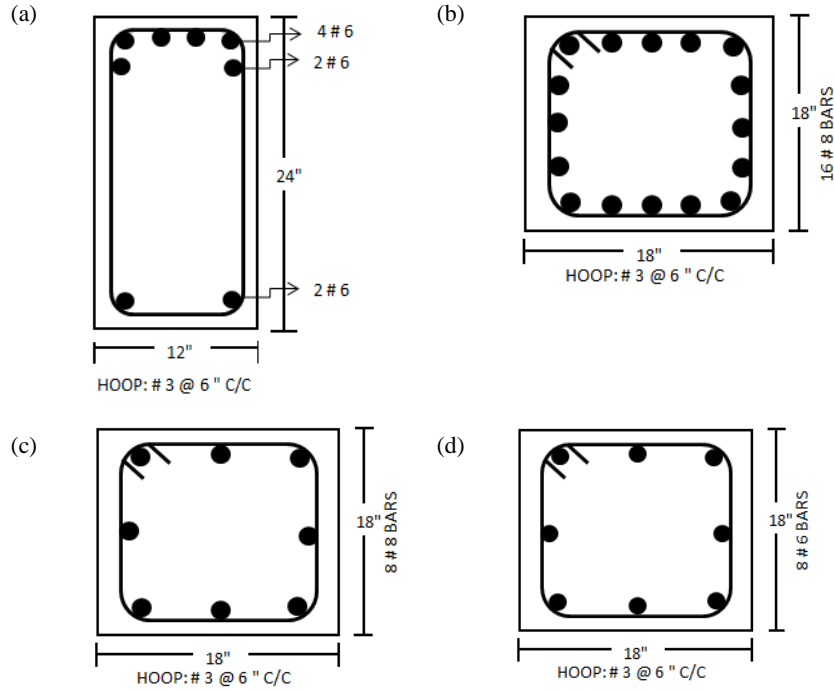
Structural detail of (a) Typical beam, (b) Interior column from base to 2nd floor, (c) Exterior column from base to 2nd floor, Interior column from 3rd to roof and (d) Exterior column from 3rd to roof
